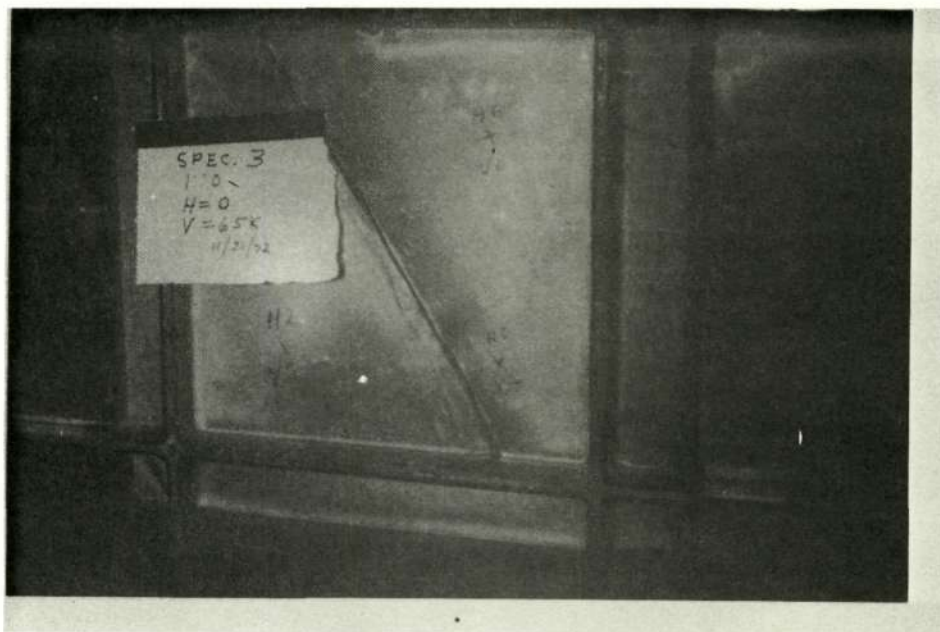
A-PANEL 3 UNIAXIAL LOAD
